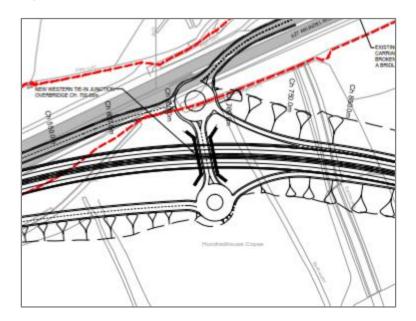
Proposed layout for New Dumb Bell Roundabout, Option 5A
